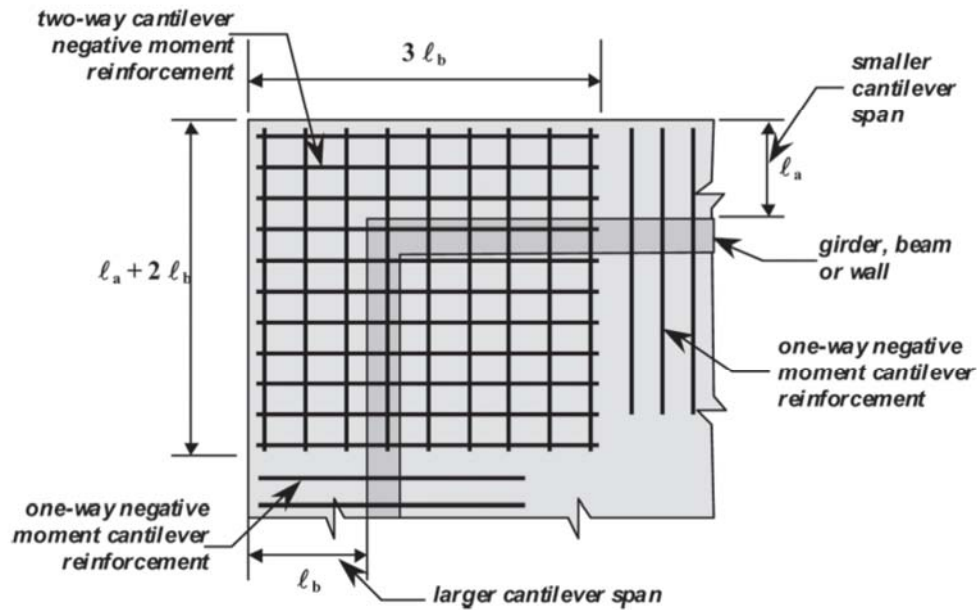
Negative moment reinforcement in two-way slab cantilevers.
